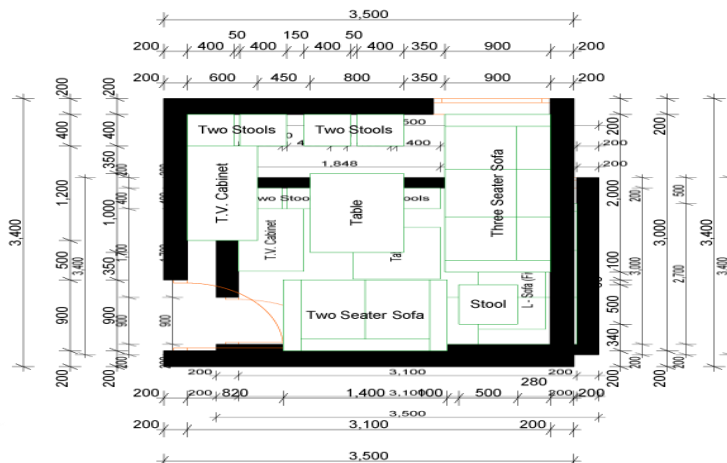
Two Bedroom, Living Room, Furniture Layout Two
